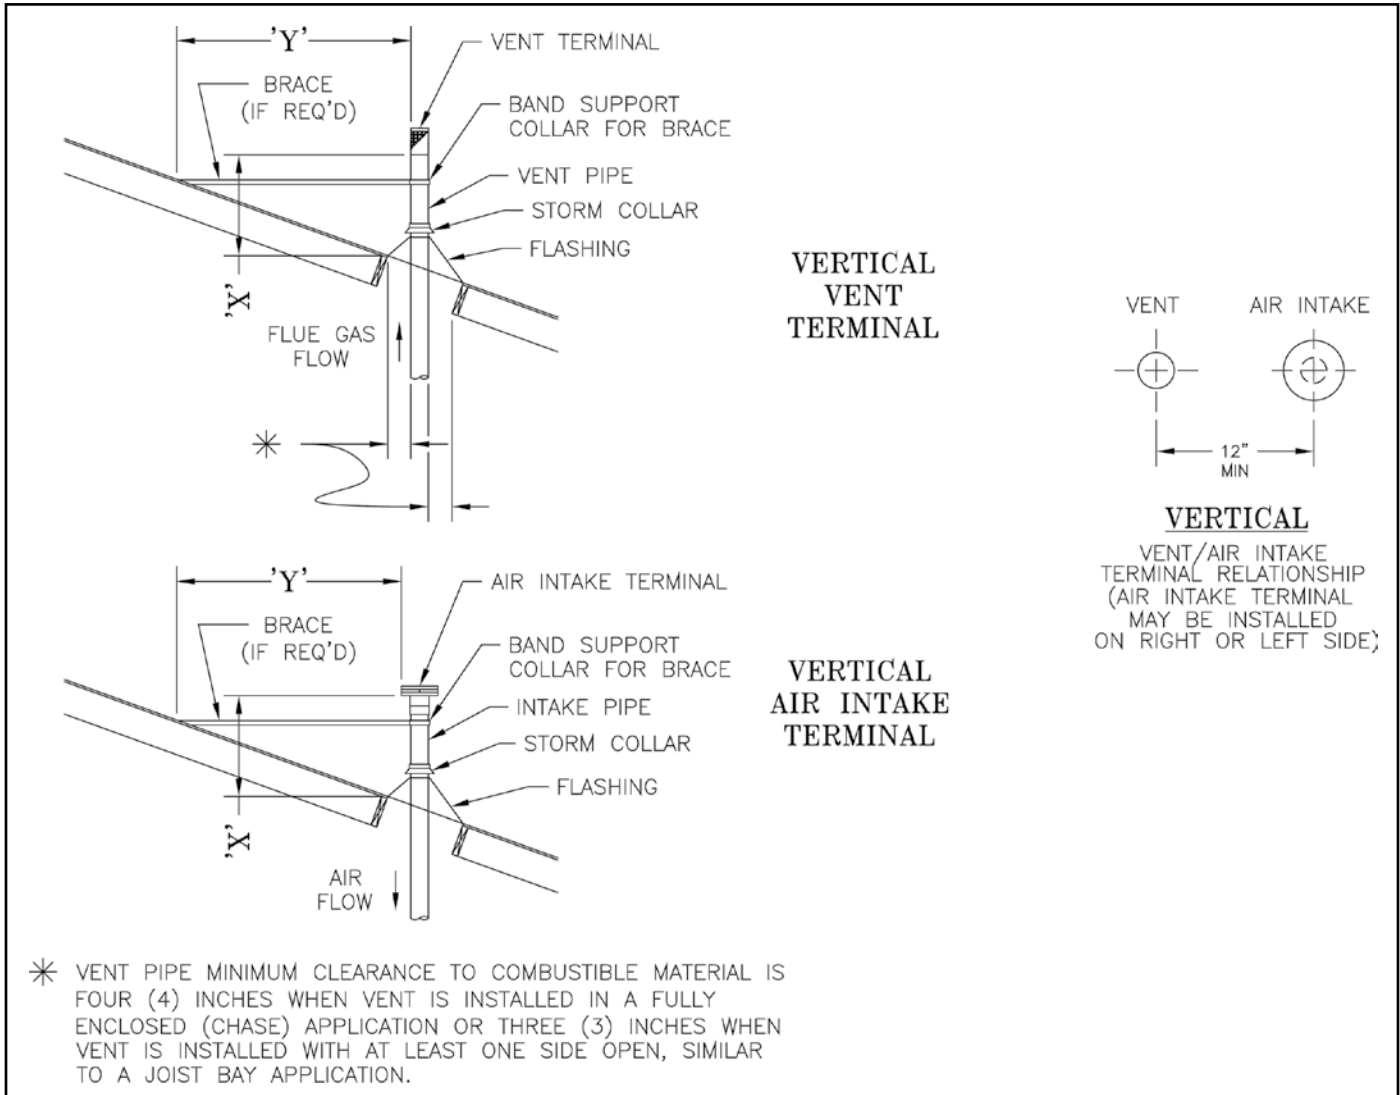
Vertical Vent/Air Termination Details for Stainless Steel Direct Vent
